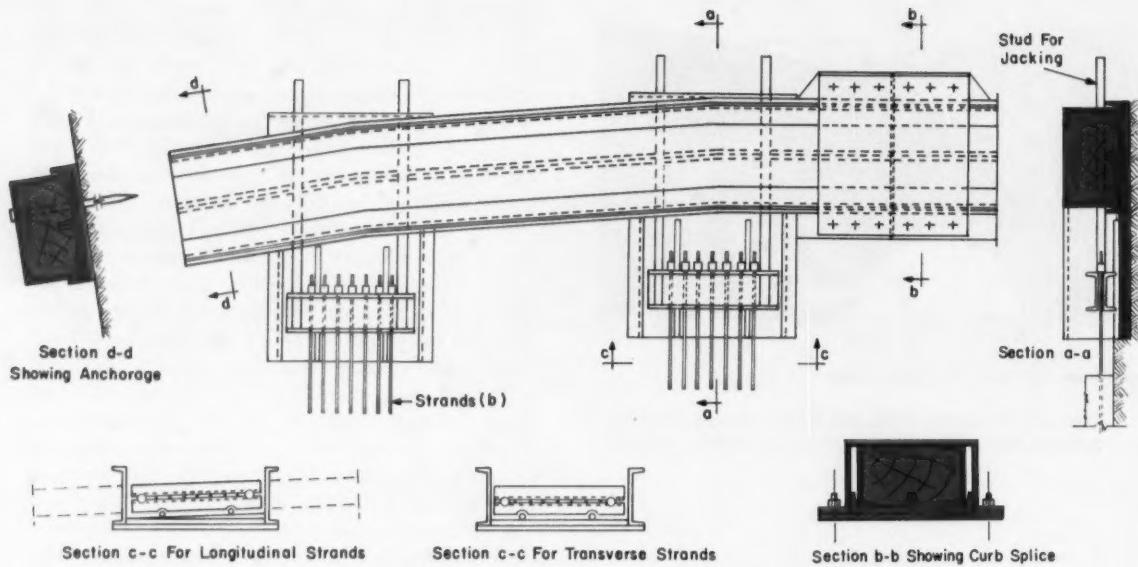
Details of portable abutment designed for use on pretensioned, prestressed pavement projects.
